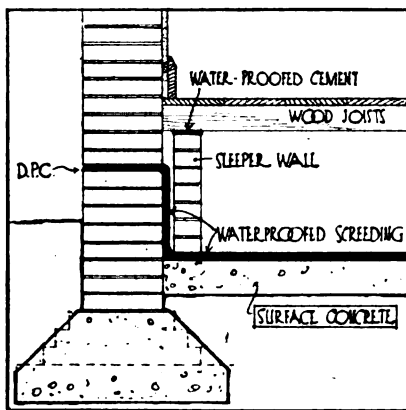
14-in brick wall, showing damp-coursing, etc., to suit joisted floors on wet sites.
